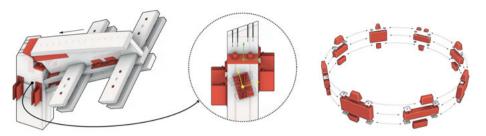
Left: Column, edge panel, beam detail; Right: Shear-Dowel Configuration...
